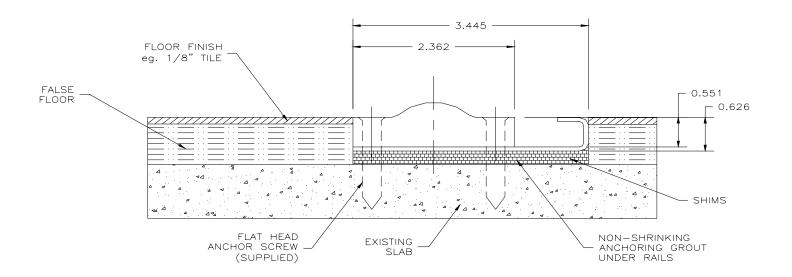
SECTION VIEW THROUGH ANTI-TIP RAIL WITH FALSE FLOOR
